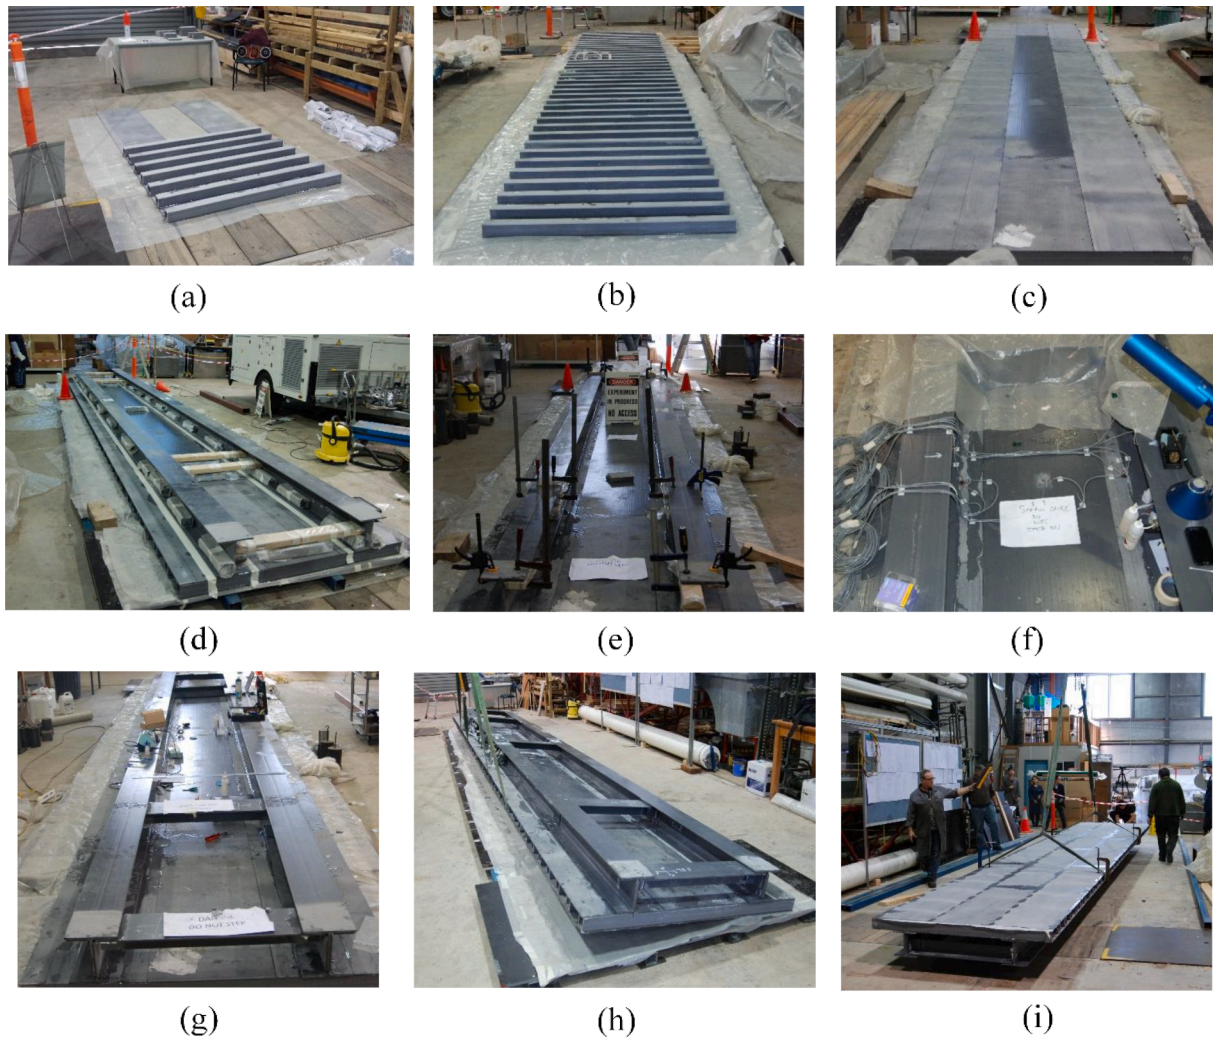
Construction sequence: (a) fabrication of sandwich modules; (b) joining of modules; (c) bonding of flat panel layer; (d) bonding of I-beam girders; (e) installation of bond plates between I-beam sections (f) installation of under deck strain gauges; (g) attaching of the T-sections; (h) flipping of MB, and (i) lifting of MB to final position.
